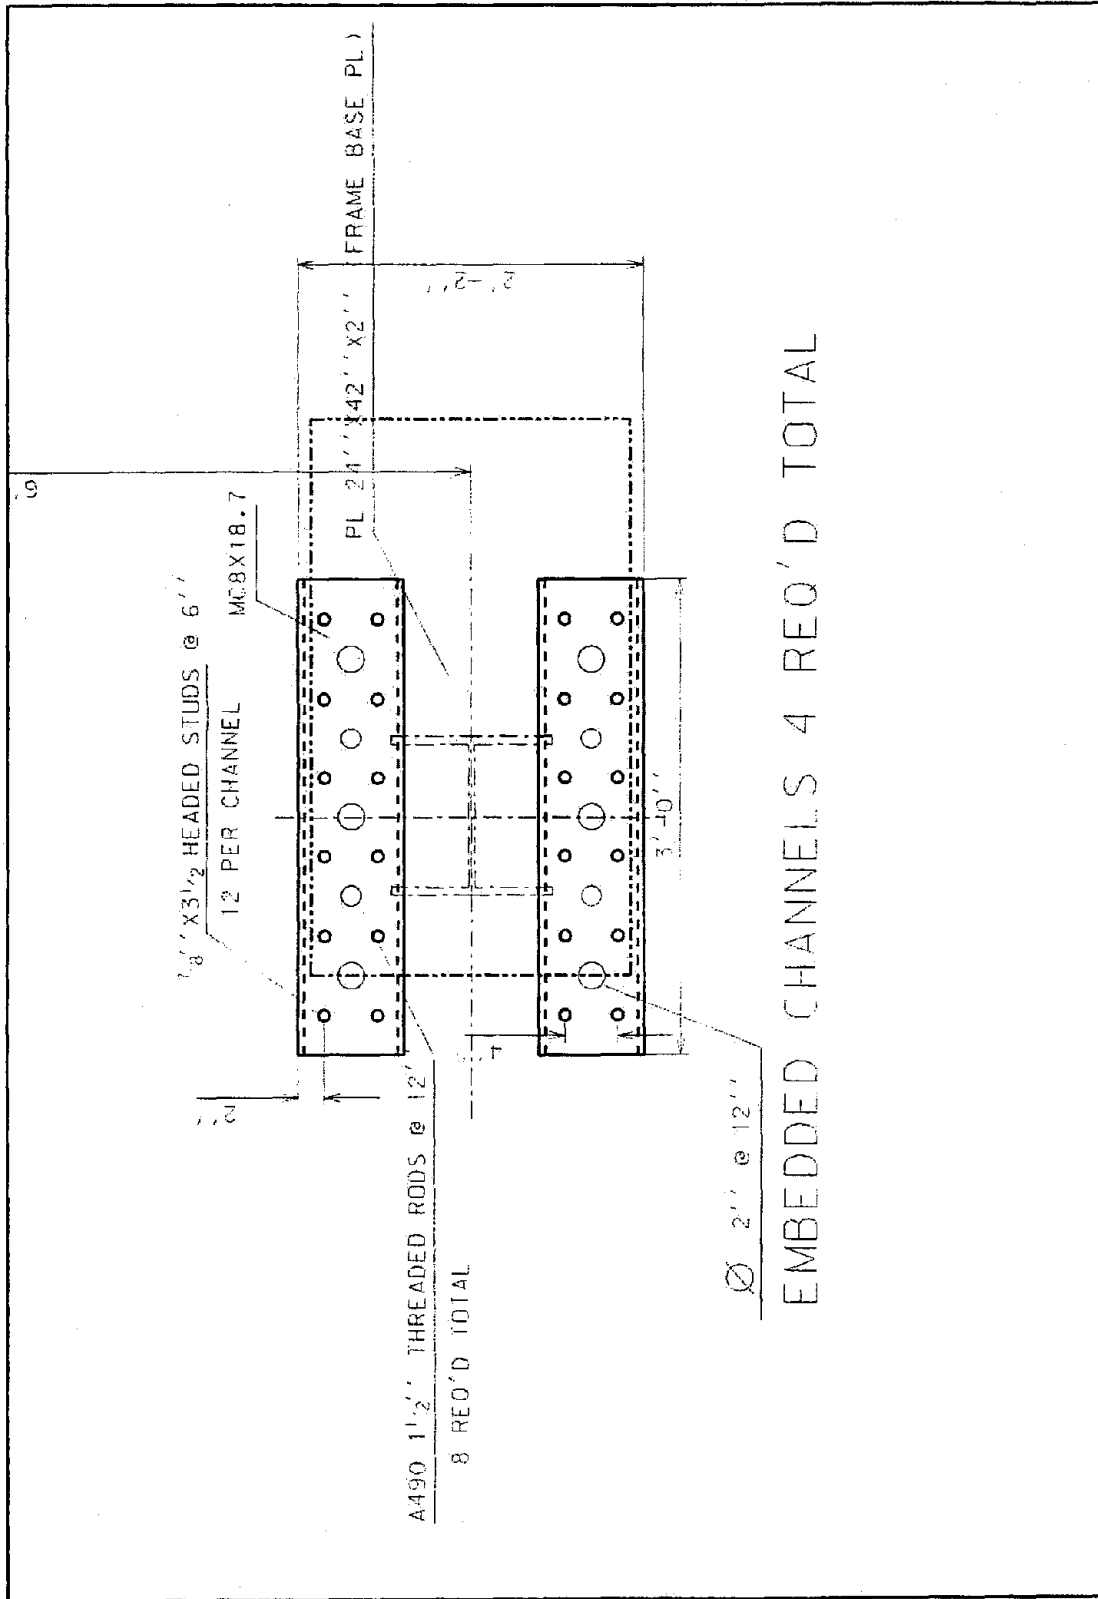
Detail of embedded channel and load frame base plate (1' = 305 mm, 1" = 25.4 mm)
